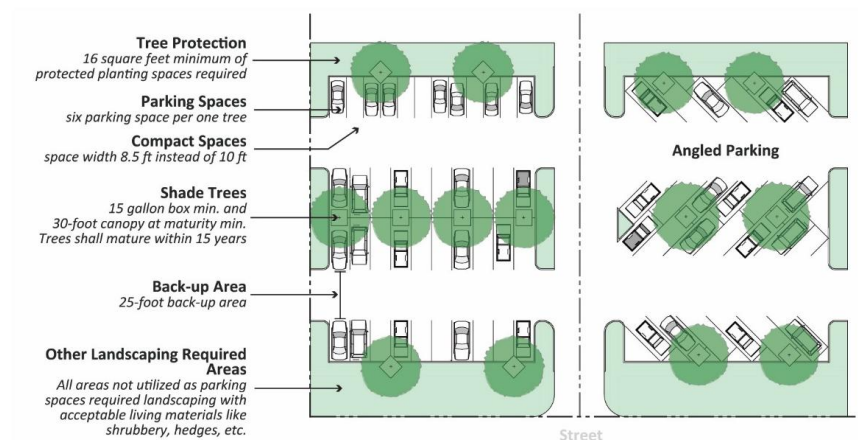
Example of 90-Degree Parking Space Dimensions
